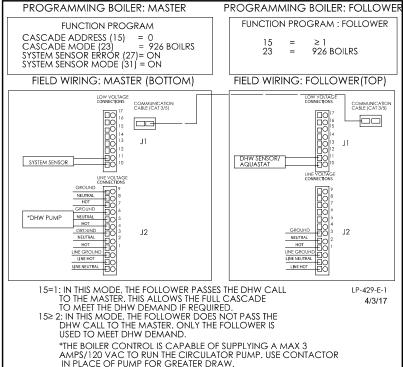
Stacked VWH Boiler with Storage Tank Wiring
